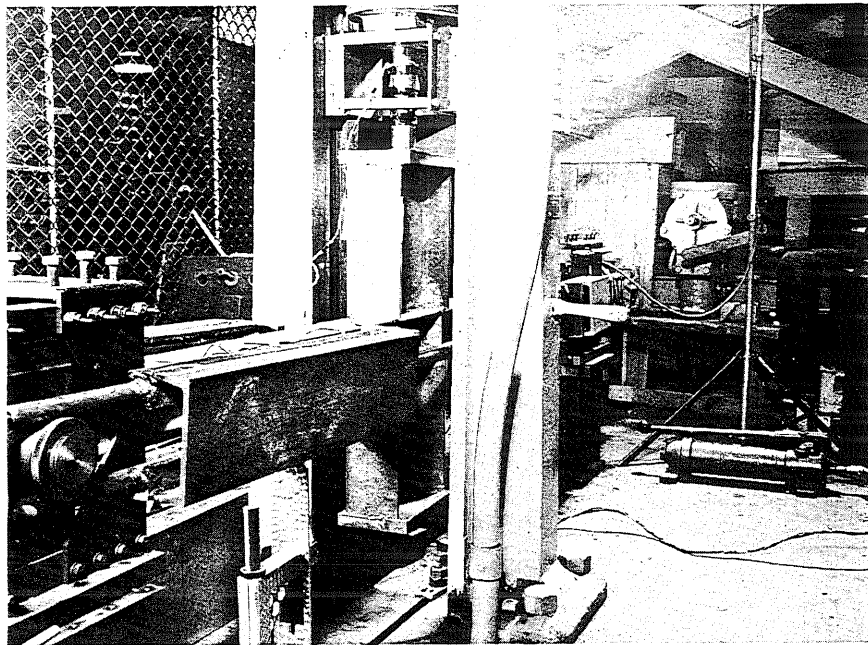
AXIAL LOAD TIE ROD SYSTEM
